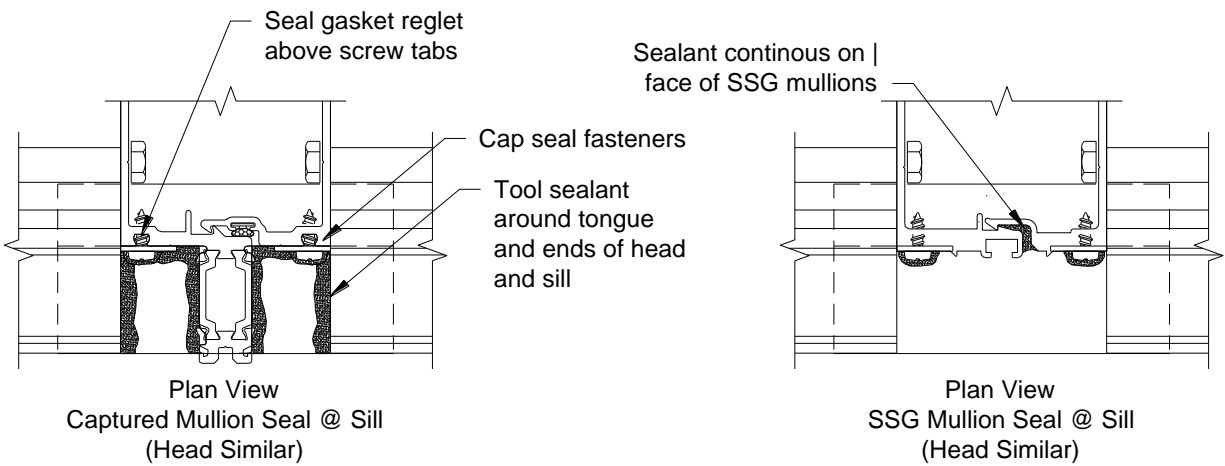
B: Mull Caps Install and Sealing (Head Similar)
